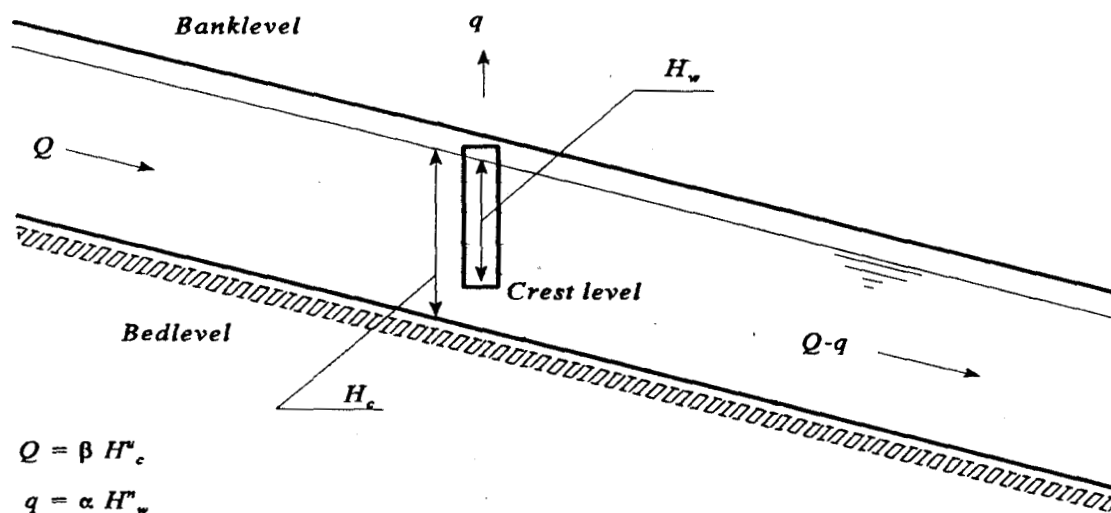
Longitudinal profile of a canal with outlet structure.
